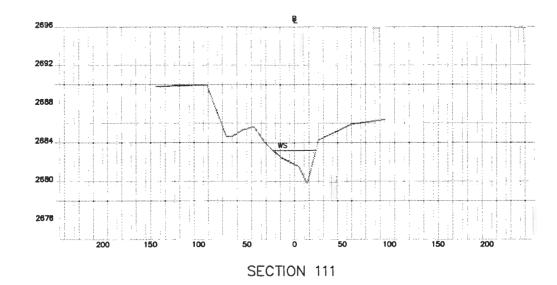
EXISTING AND PROPOSED CHANNEL CROSS-SECTIONS LITTLE WEISER RIVER SECTION 1135 & CHMHILL GLADHART LANE BRIDGE SECTION 14
